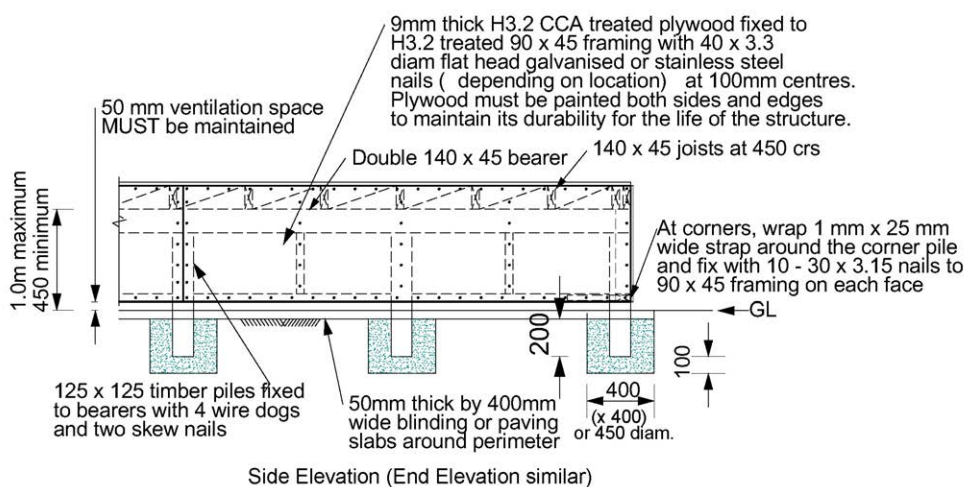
Perimeter foundation details for Type 1 surface structure
